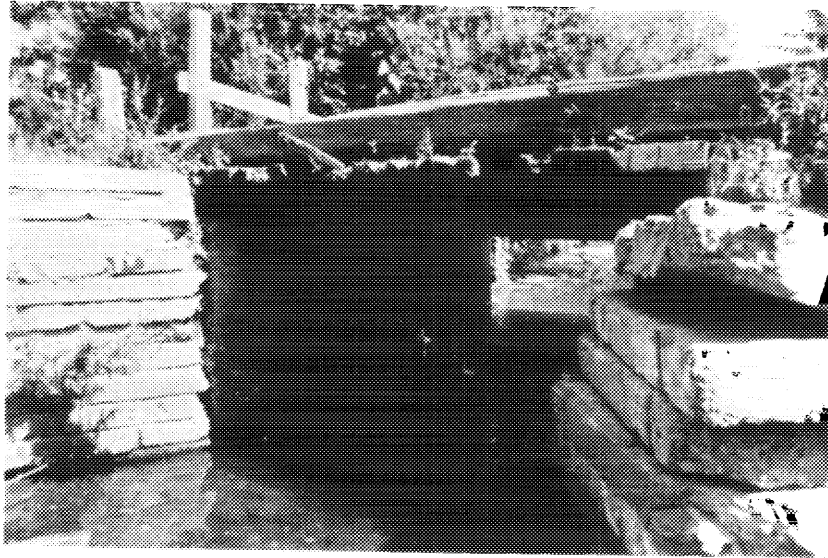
VINTON STREET BRIDGE - MILL RIVER
